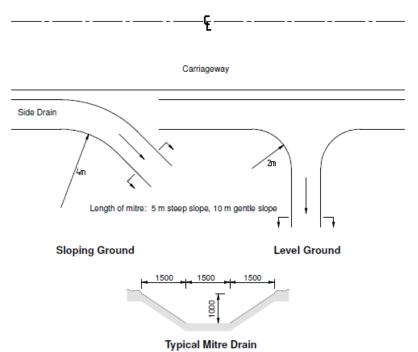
2 Typical Stormwater Mitre Drain / Channel
